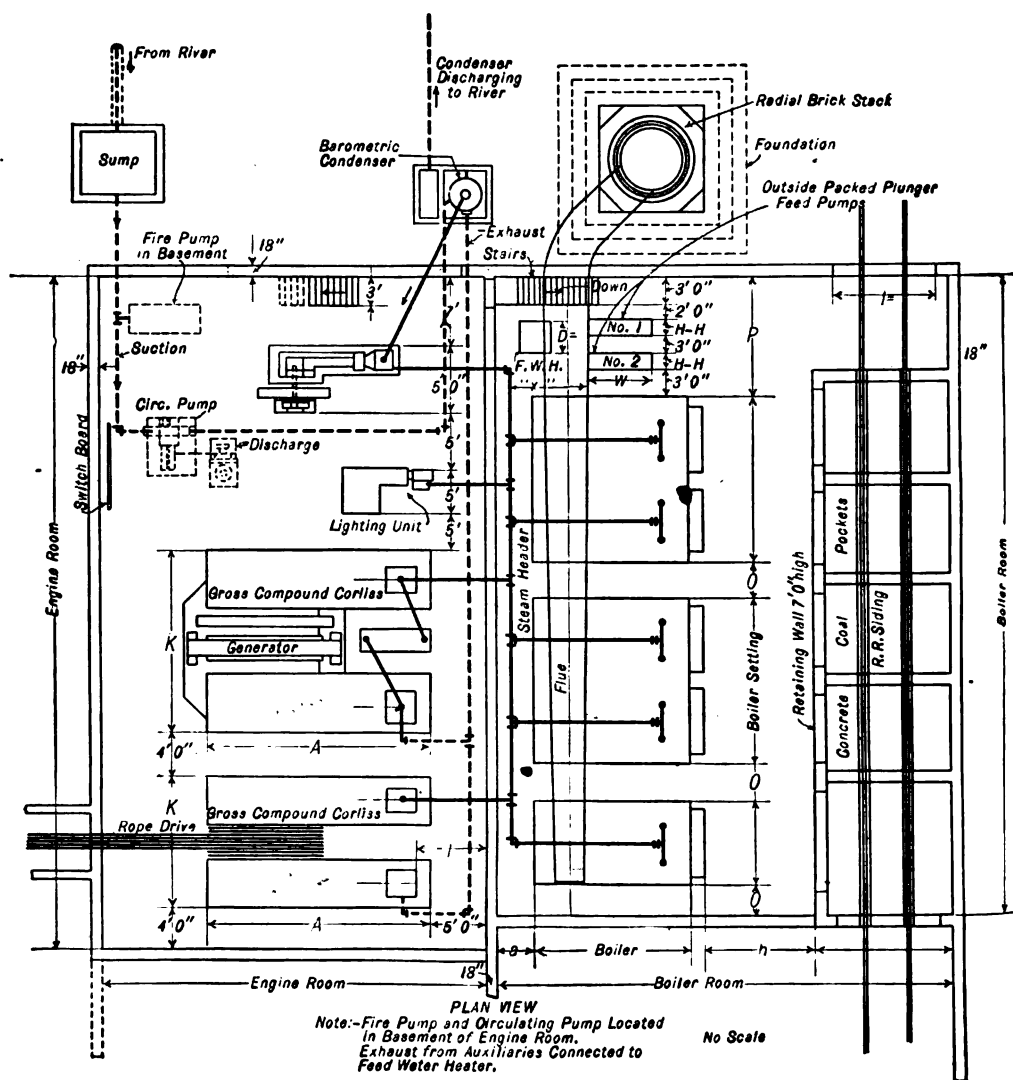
PRELIMINARY SKETCH, SHOWING ARRANGEMENT OF BOILER- AND ENGINE-ROOM.
